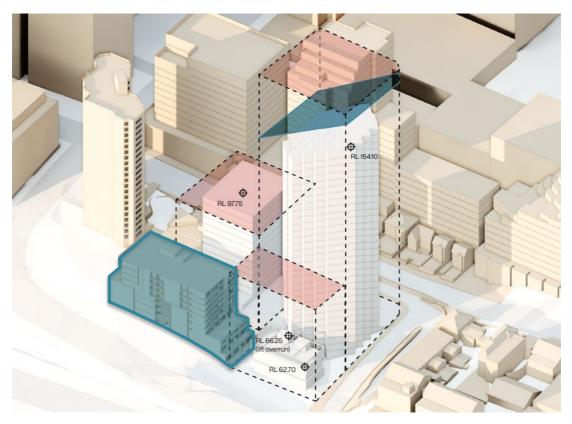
Proposed envelopment of development and location of 88 Berry Street shown in blue (Rothelowman, edits by The Planning Studio)
